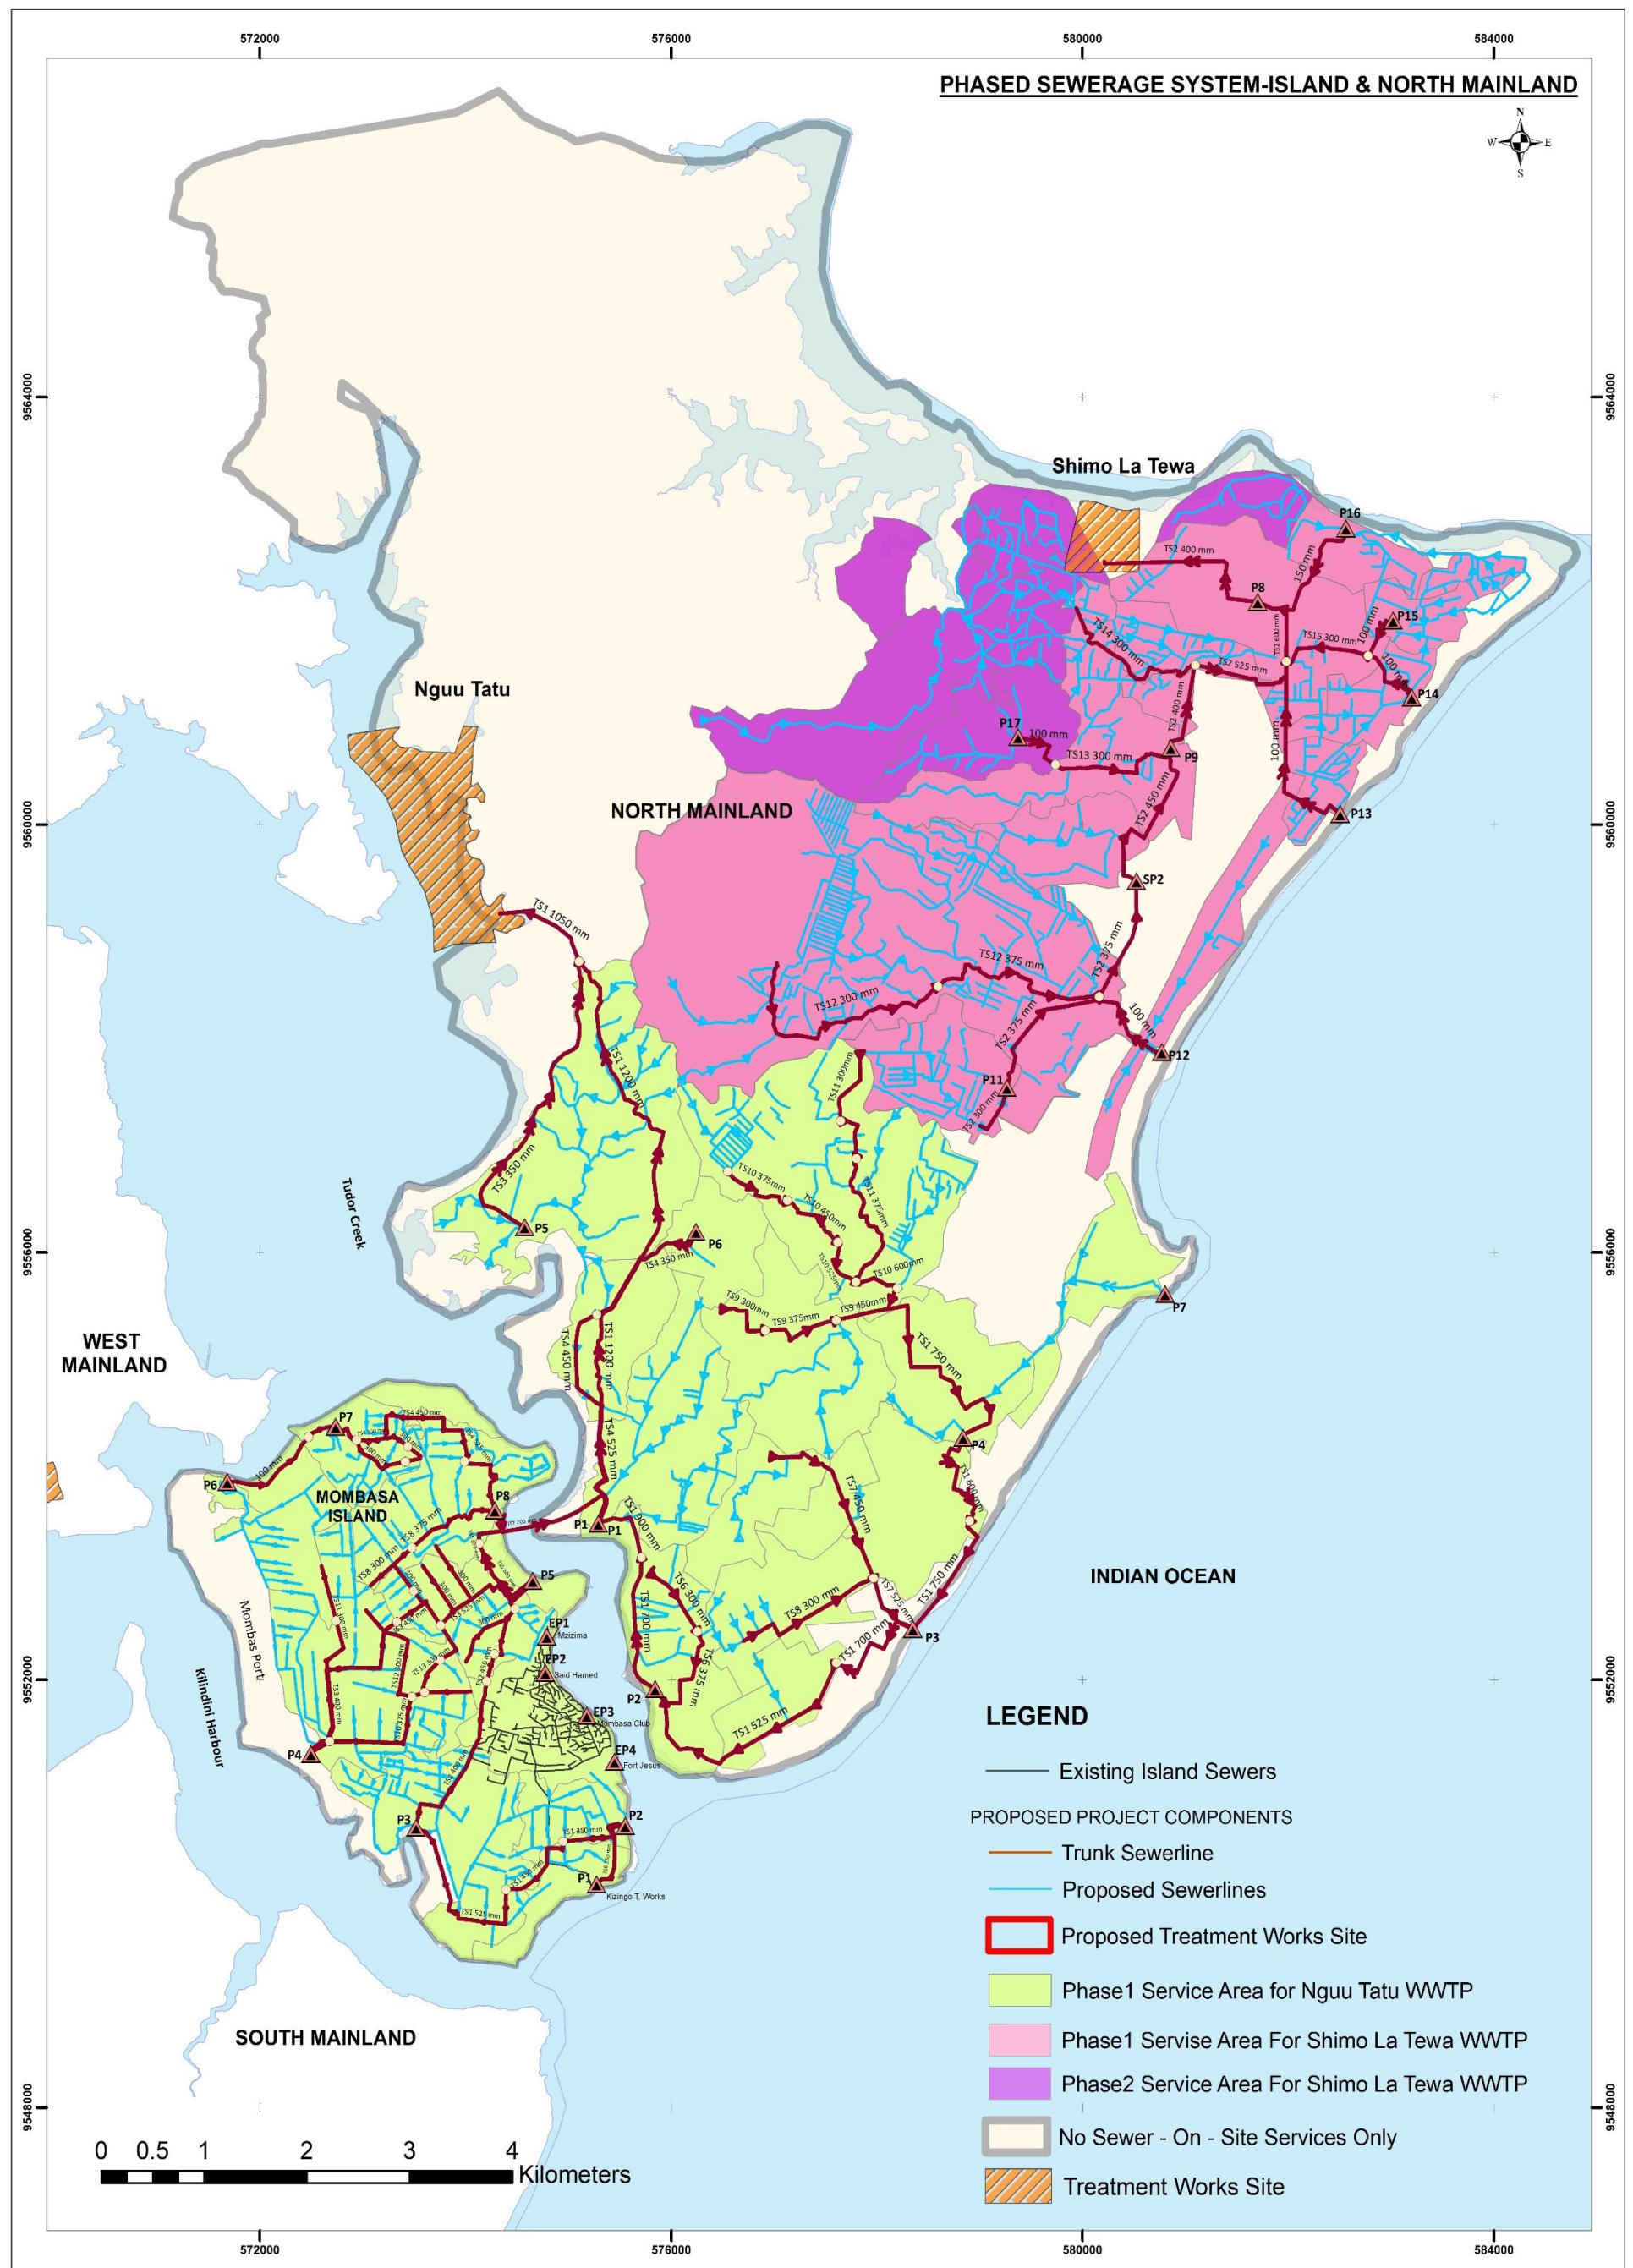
Layout Plan of the Phased Implementation of Sewerage System
